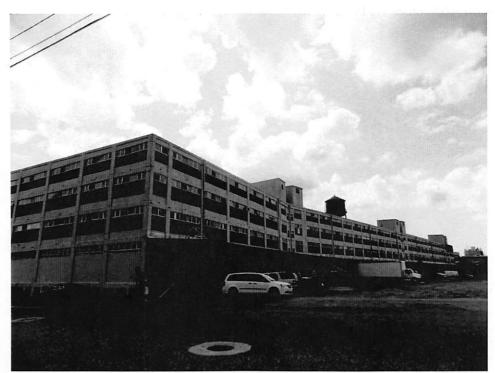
Exterior, north and west (front) facades, looking southeast.
